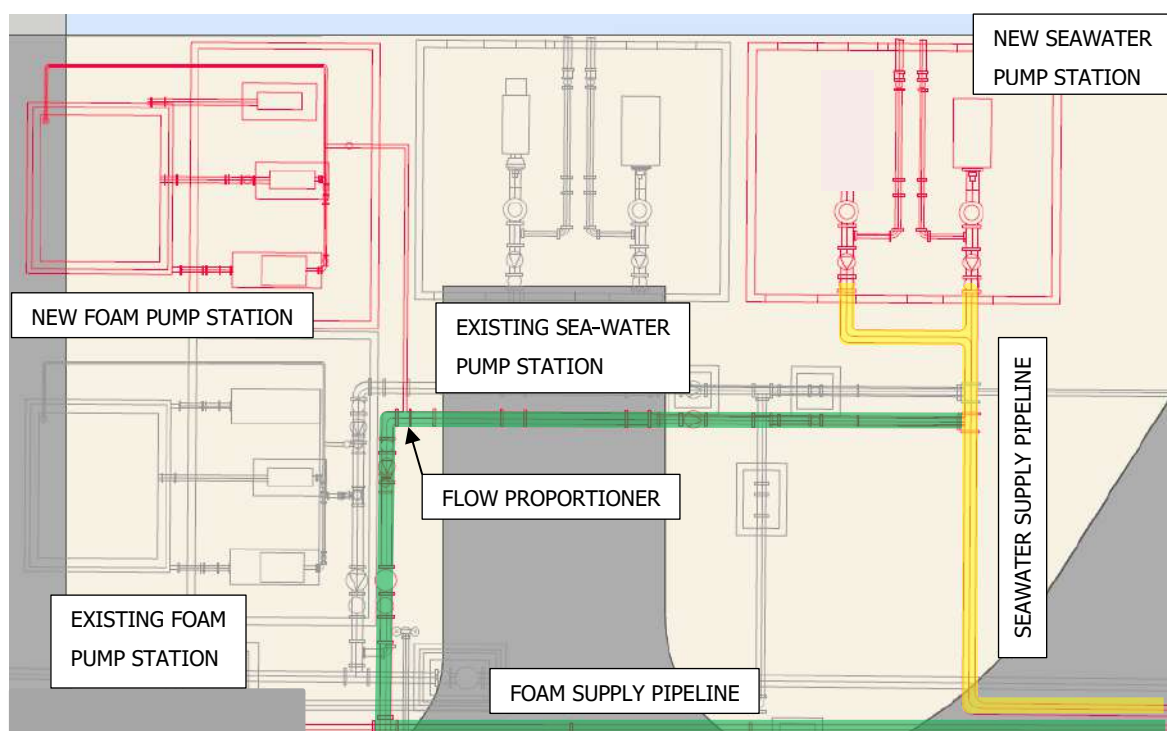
Existing and Proposed New Seawater and Foam Pump Facilities
